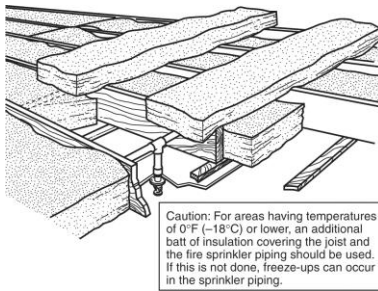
(b) Insulation Recommendations – Arrangement 2.
